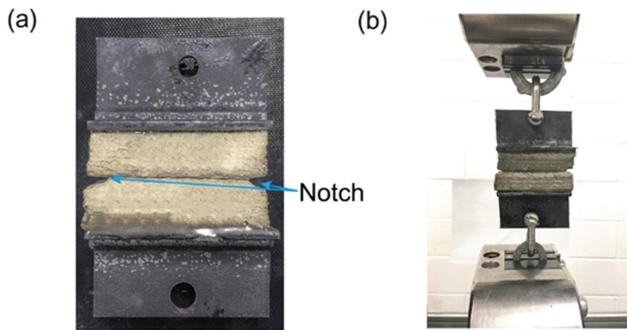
(a) Test specimen for measuring the inter-layer strength, and (b) Test setup.
